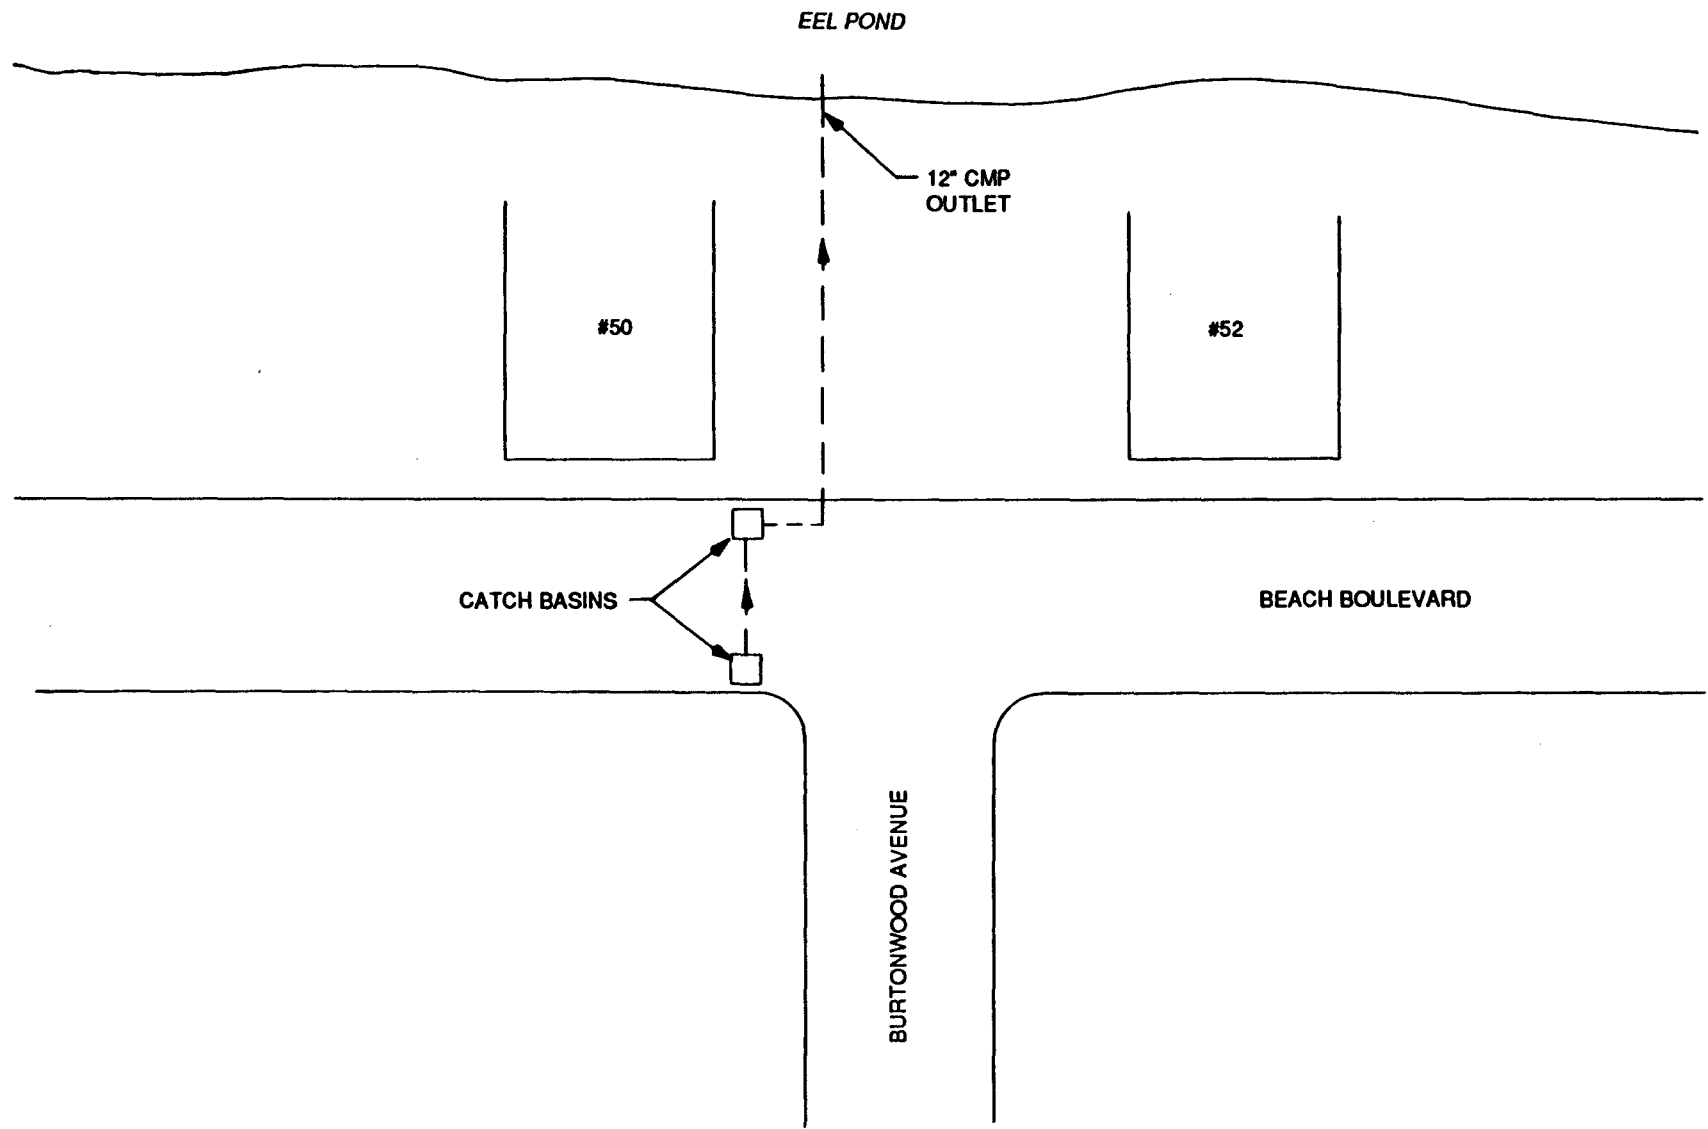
BEACH BOULEVARD/BURTONWOOD AVENUE DRAINAGE SYSTEM
